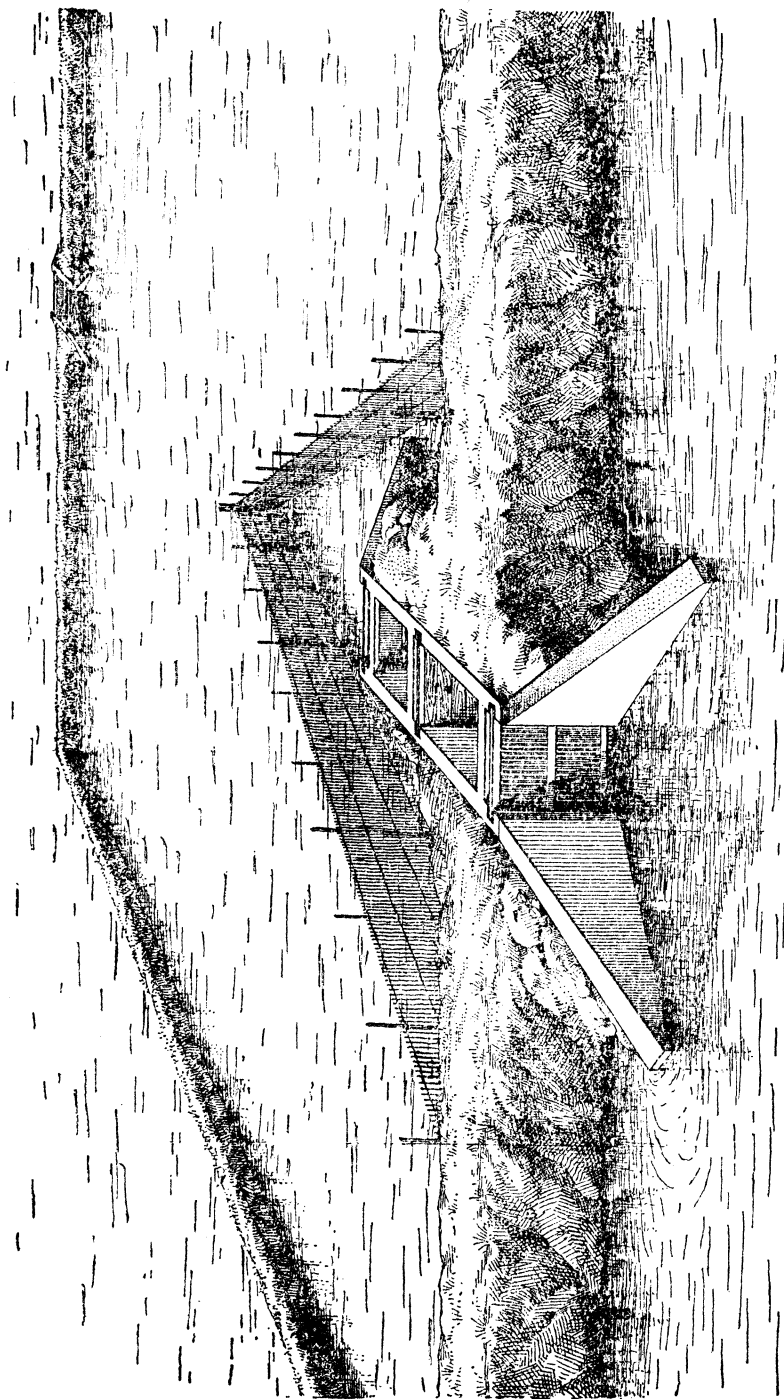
Schematic sketch showing kulungan, head gate, saplad, and secondary gate in background.
